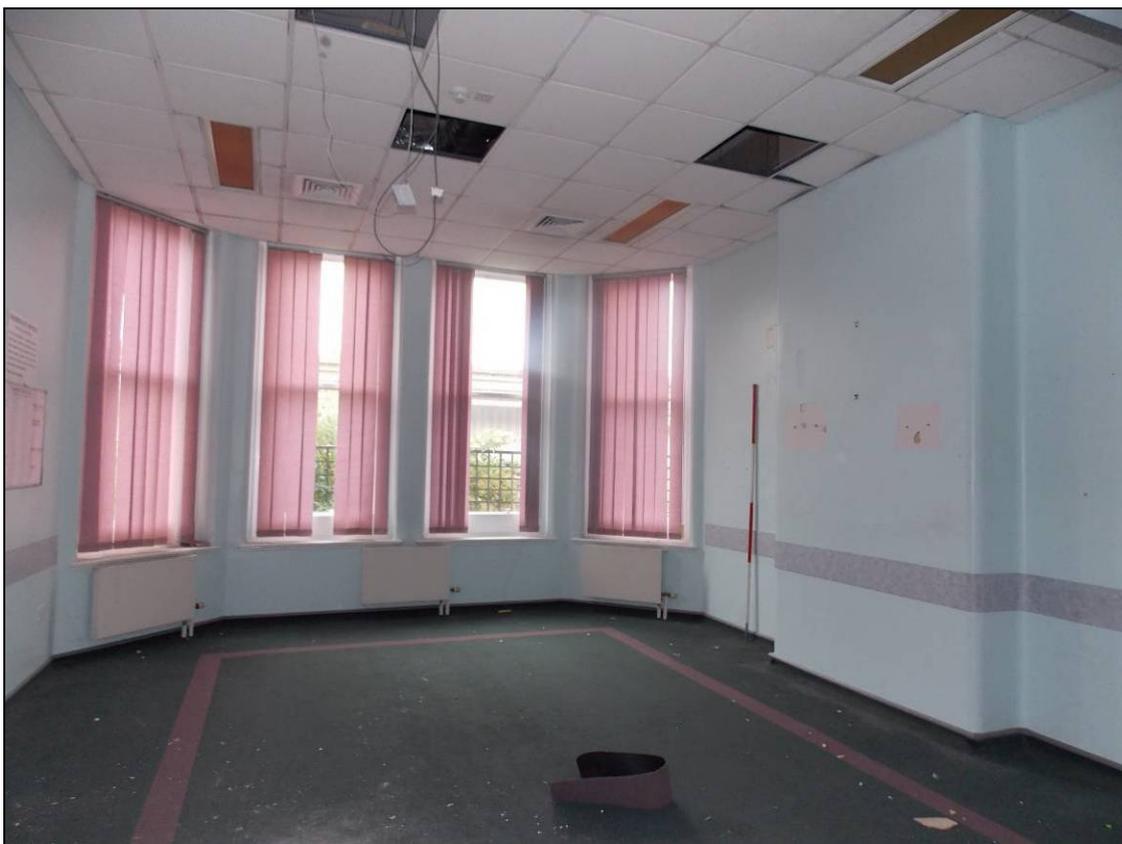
Waiting Room with chimney breast and bay window, looking east (scale 2m).
